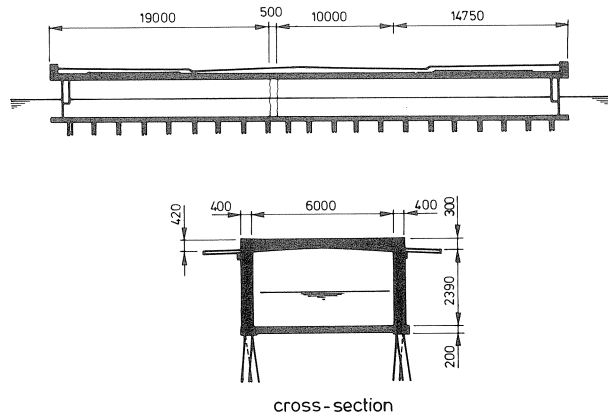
Large cracks in an underreinforced underpass (measures in mm).
